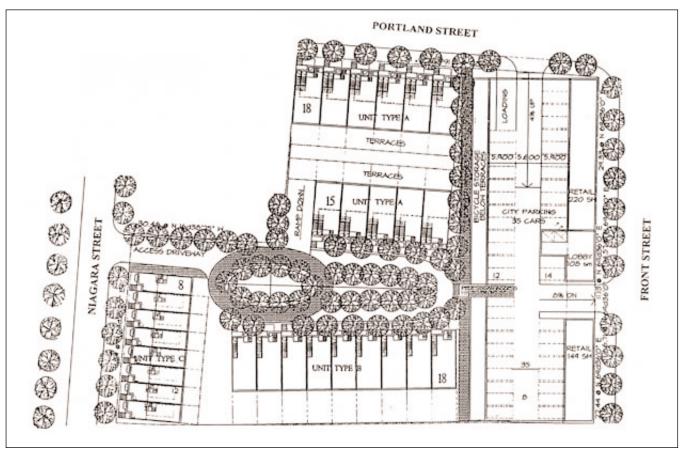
Site plan for Portland Park Village showing, left, the four townhouse complexes, and right, the condominium apartment building
